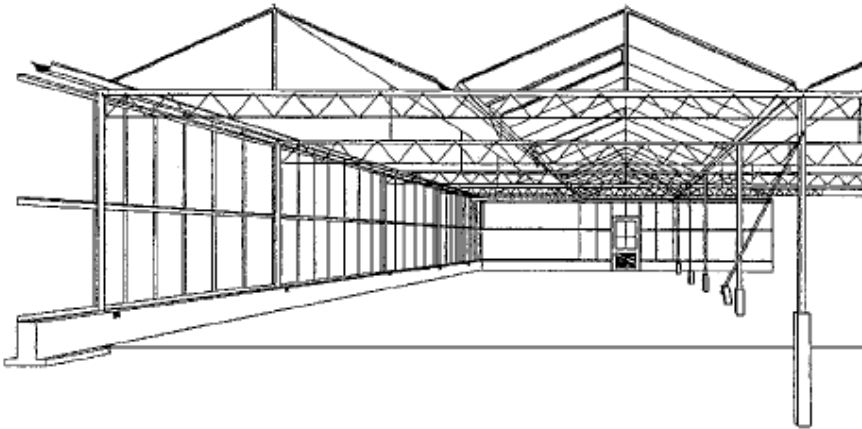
Venlo-type glass-covered greenhouse with trellis girders
